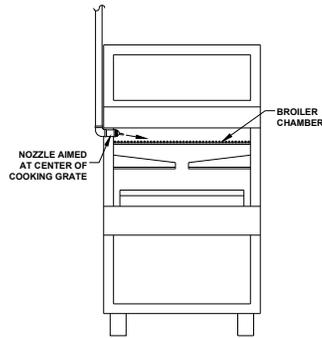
Upright Broiler 36" (91 cm) x 24" (61 cm) Model N-1LP Nozzle
